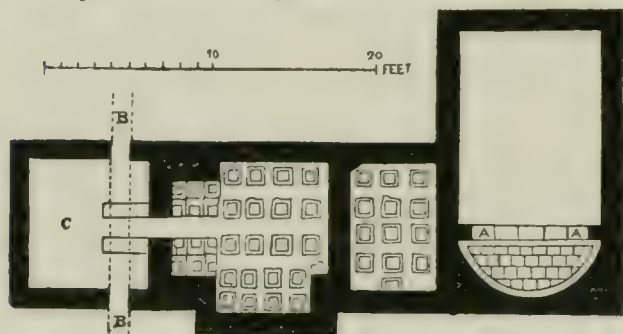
BATH HOUSE AT CHIPPING WARDEN.
